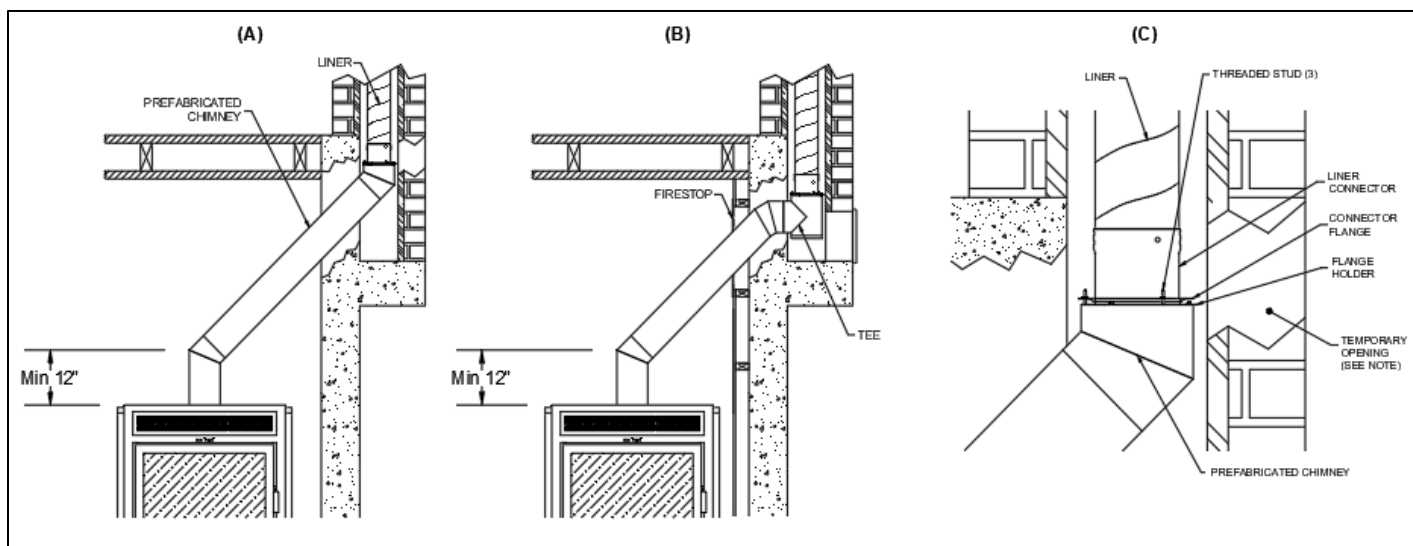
(A) Connection into a masonry chimney through an elbow/liner; (B) connection into a masonry chimney through a tee/liner; (C) detailed drawing of masonry chimney connection.
